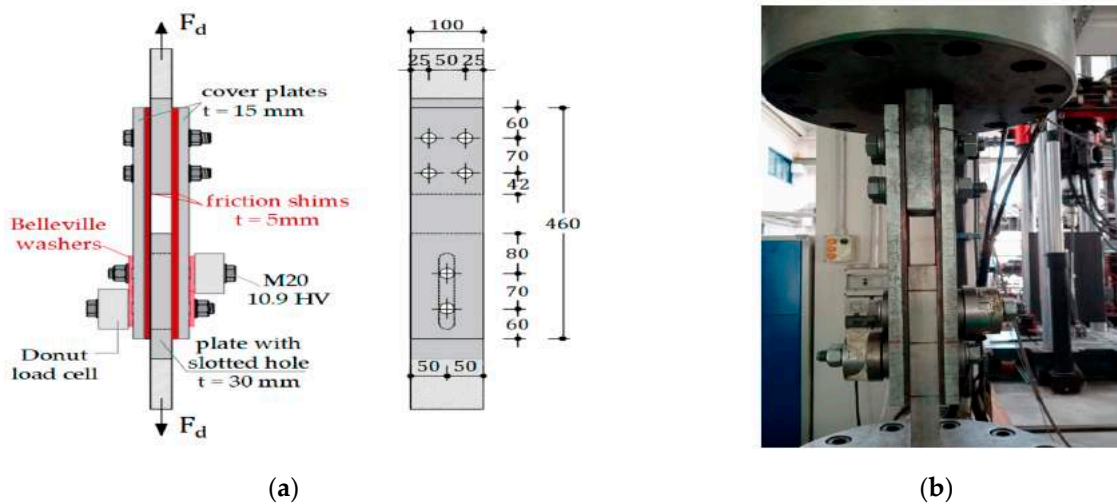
(a) Geometrical details of uniaxial friction device; (b) Tested specimen (taken from [64]).
